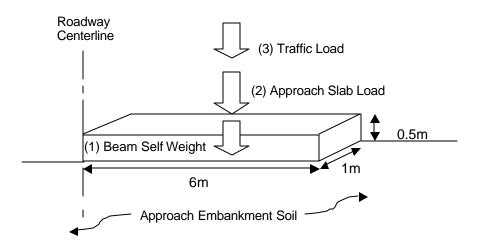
Representation of Bridge Approach Sleeper Beam and Loading for PLAXIS Model.
